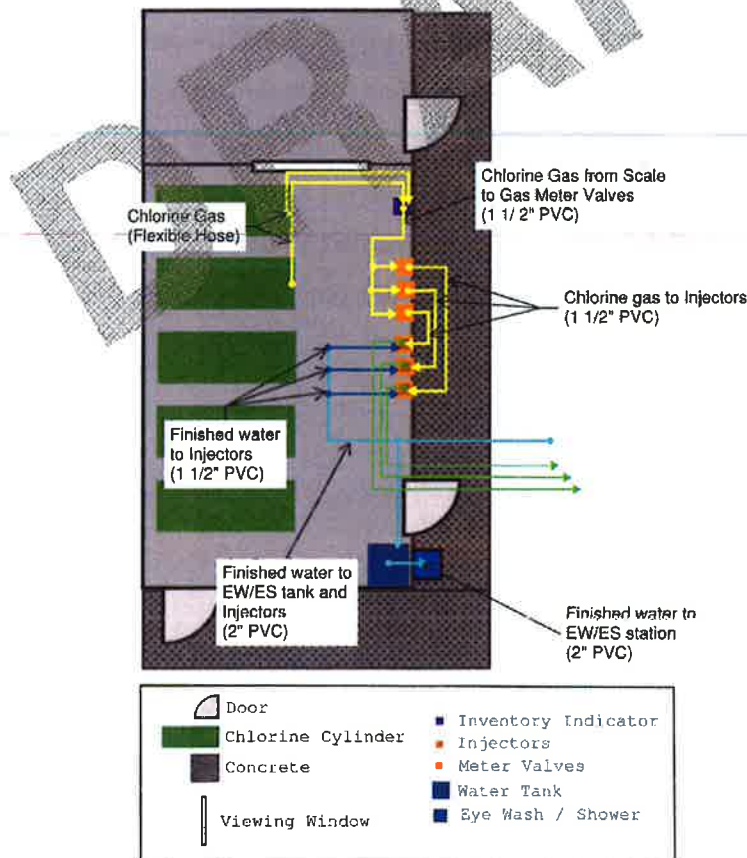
Alternative Two Floor Plan General Connectivity Piping Layout
